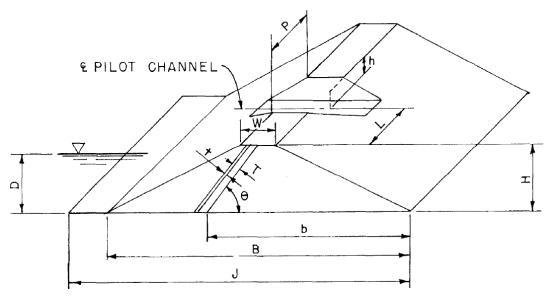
Perspective view of the fuse plug embankment with the pilot channel [3]
